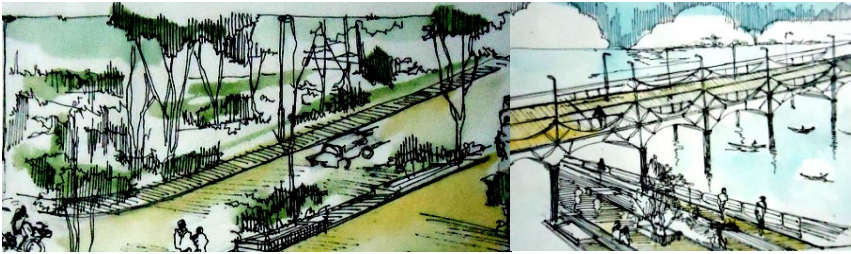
Redesign of the road-cum-embankment on the western part of Dhaka to provide levels of walkways with stairs, lookout platforms and sensitive illumination to bring people close to water and encourage them to have fun. Bridges with vertical and horizontal clearance can enhance connectivity, accessibility and aesthetics of the routes.
